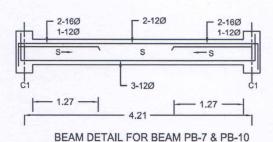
### DETAILED DRAWING OF REINFORCEMENT OF BEAMS AT PLINTH LEVEL
